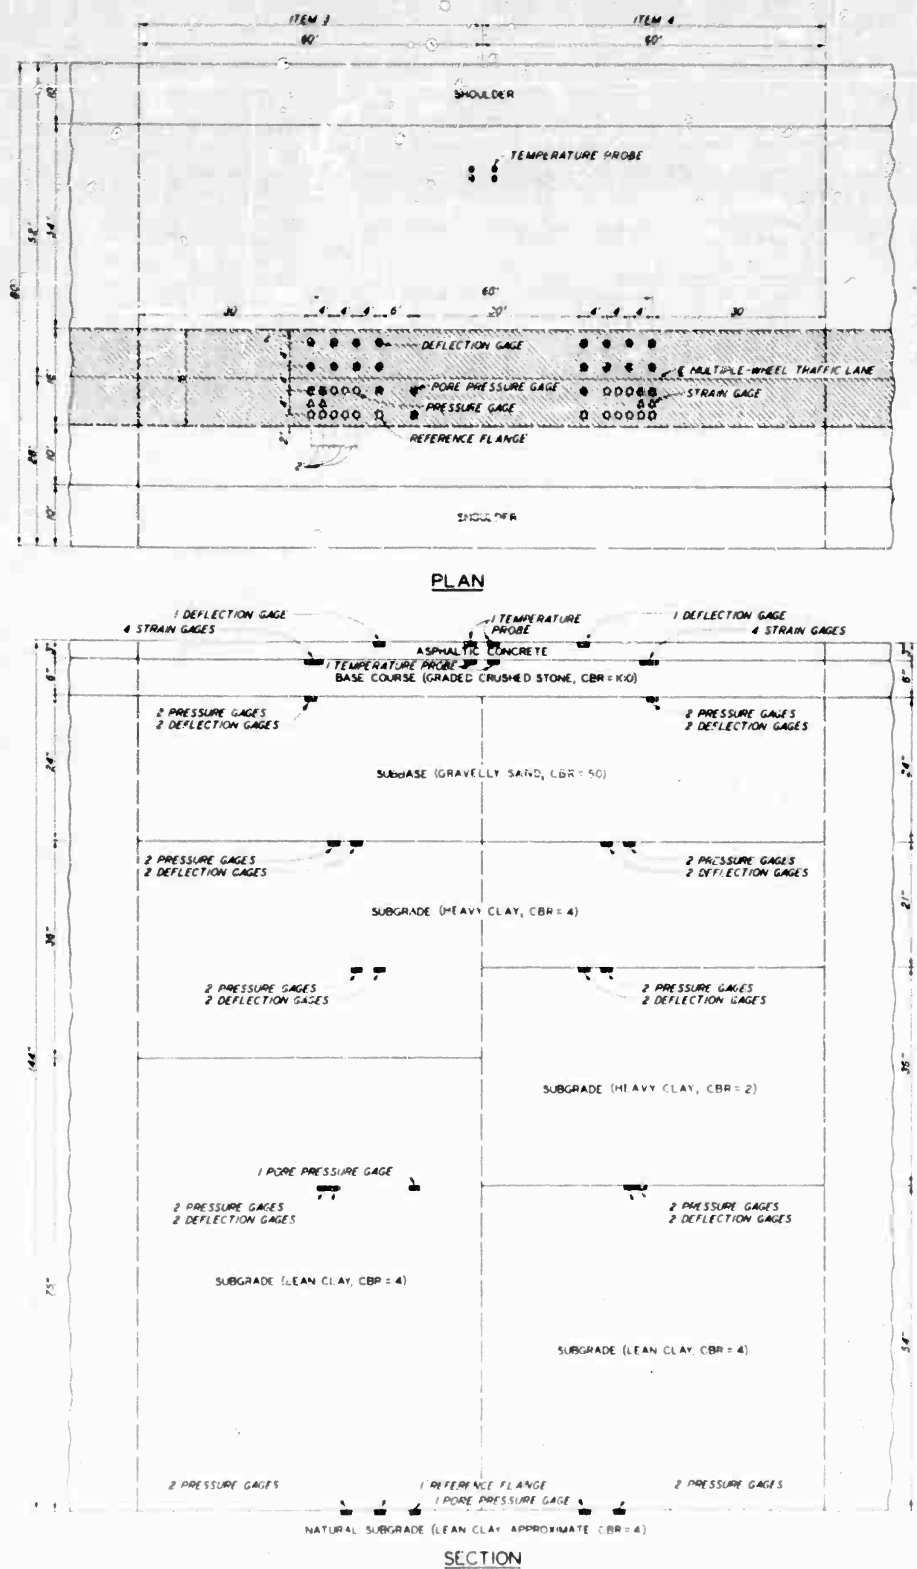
Instrumentation Layout for Flexible Pavement Test Section
